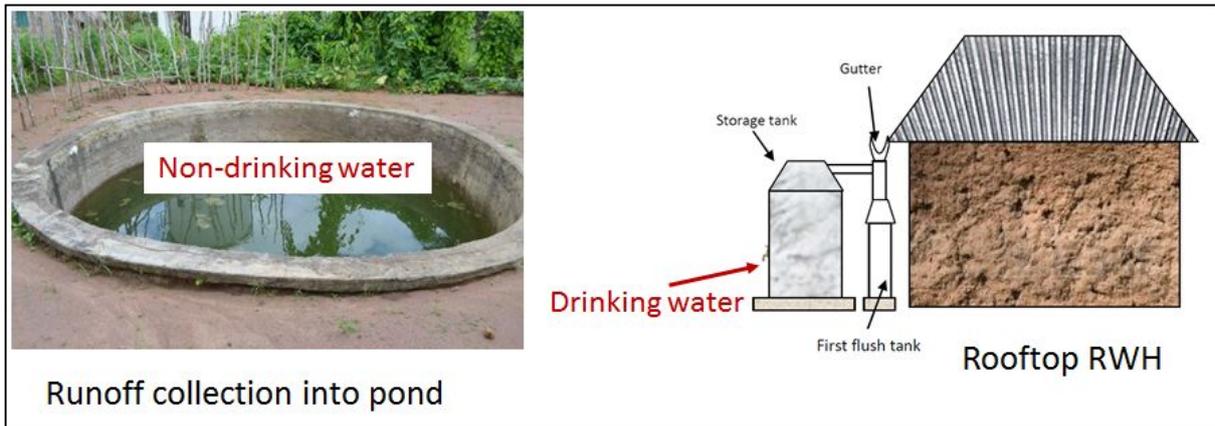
Proposed reliance on both surface and rooftop rainwater runoff collection
